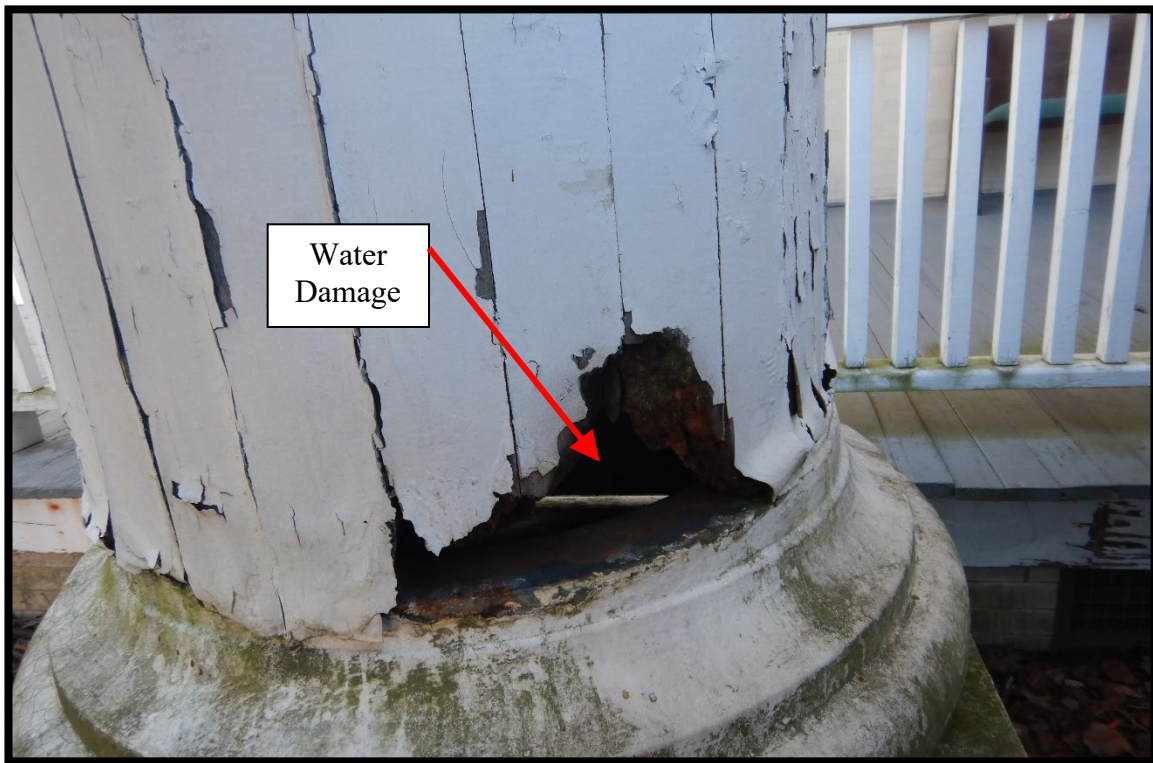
Severe column water damage, but appears to be limited to the base.
